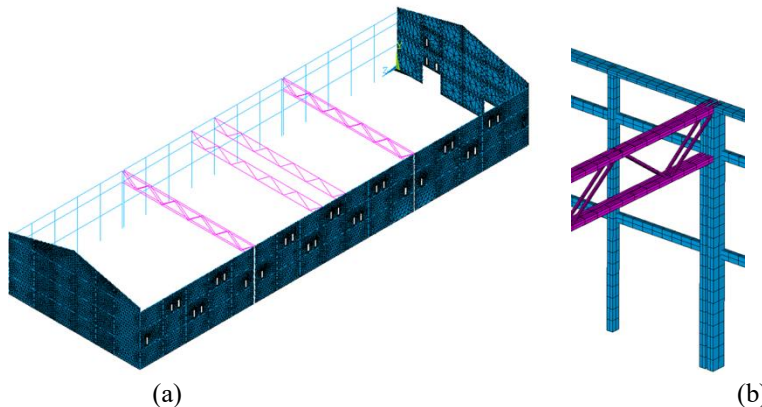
Finite element model of the building after the interventions. (a) Overall model of the structure (line mode); (b) detail of the column-to-truss connection
